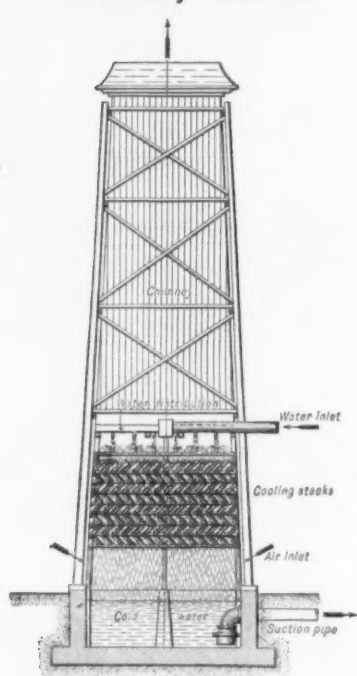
shows a sectional view of a chimney draft cooling tower built over a concrete basin set into the ground.
